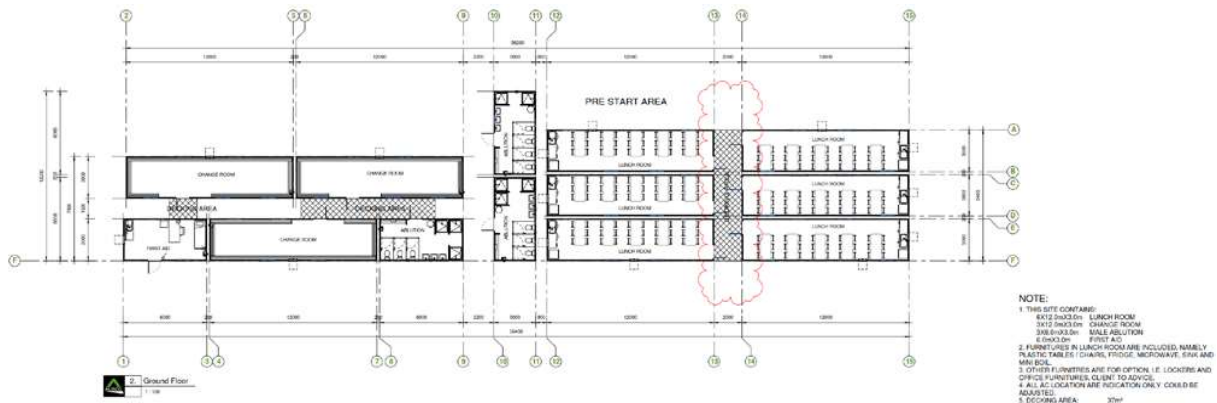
Proposed Under the Steps Main Site Compound with Lunch Rooms, Change Rooms, Ablutions, First Aid and Decking Area
